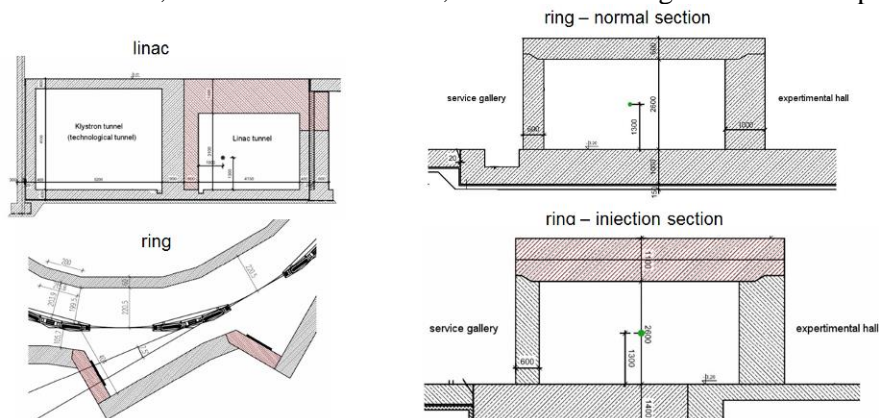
SOLARIS shielding walls. Red colour indicates heavy concrete.
